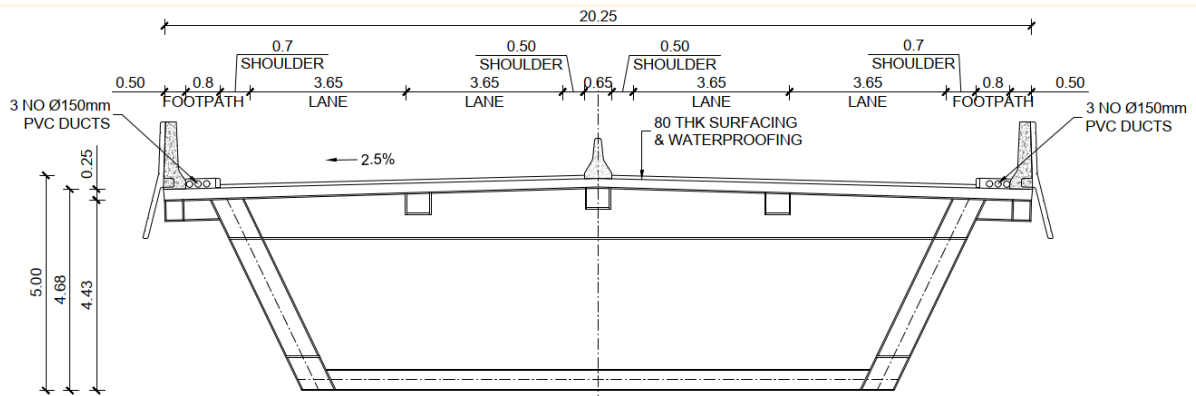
Typical cross section for truss spans in the midspan (Main span) for Bhola-Lakshmipur.
